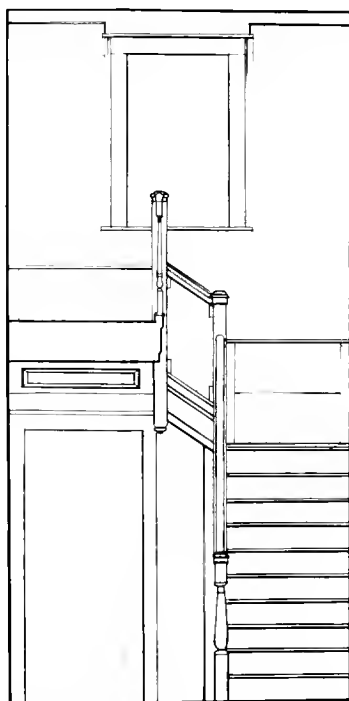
West Hall, West Elevation This elevation was designed by Okie,
